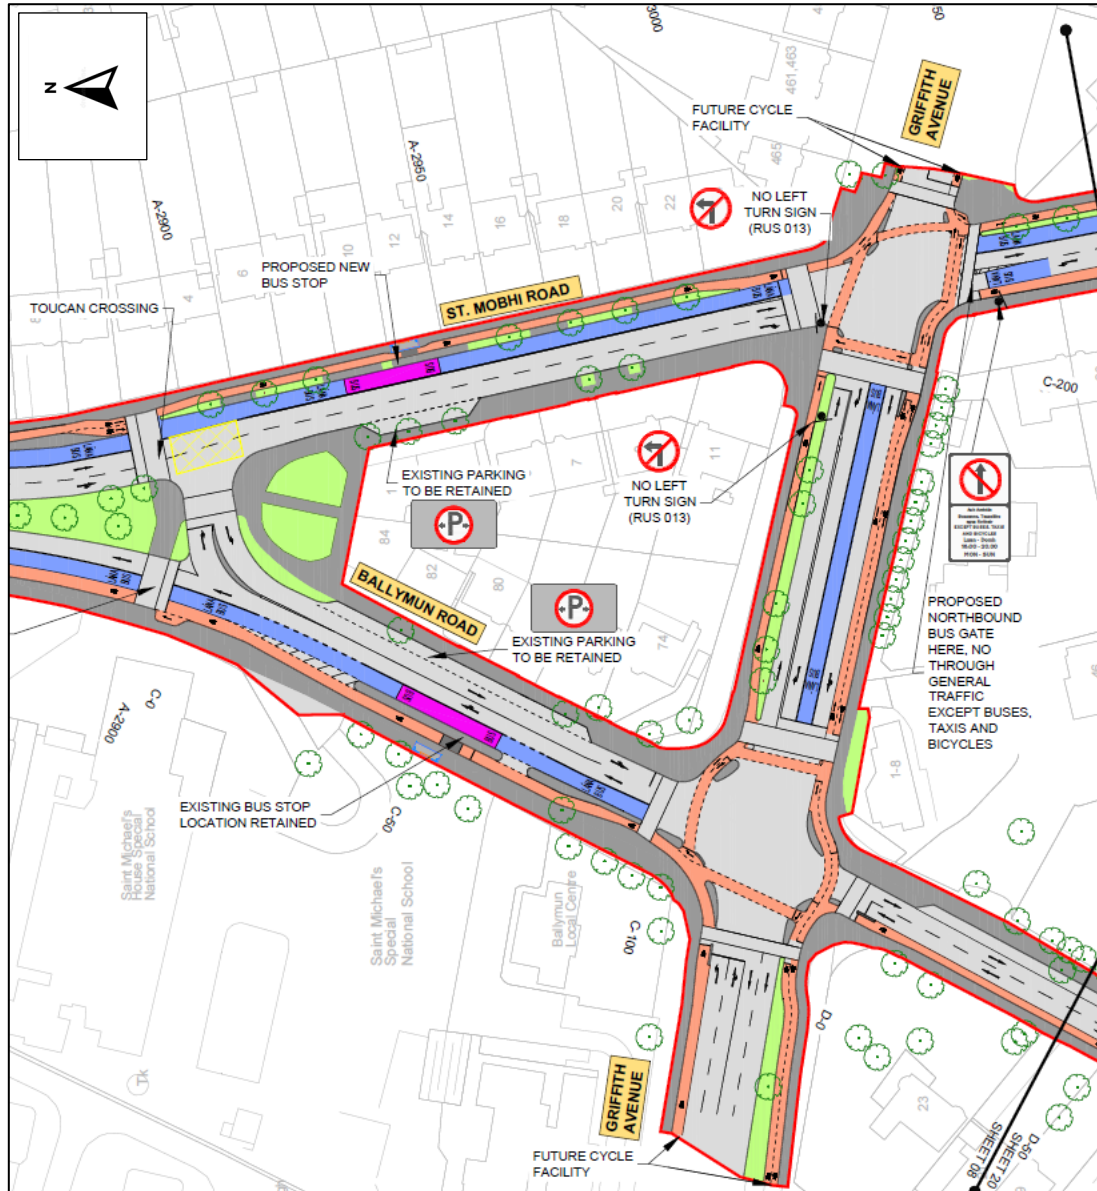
Extract from General Arrangement Drawing Sheet 9 at Griffith Avenue
